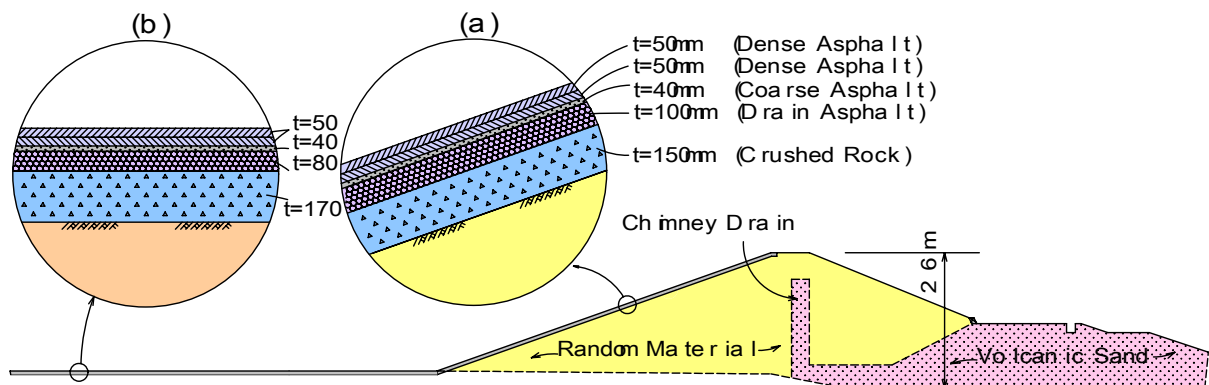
Standard Cross Section of Embankment and Structure of Facing
